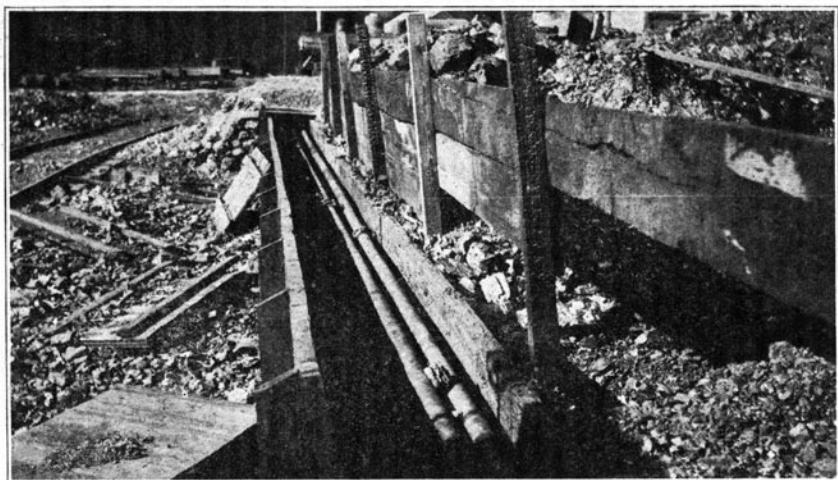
HOT STEAM PIPES ABOUT WHICH COAL WAS PILED, CAUSING FIRE
